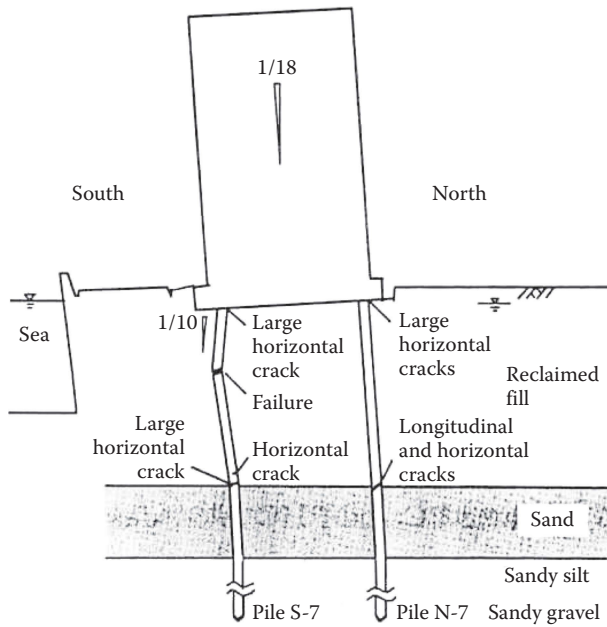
Failure of piles in a three-storied building in 1995 Kobe earthquake. (Adapted from Tokimatsu, K. et al. 1997. *Journal of Structural Engineering AIJ (Japan)*, 495, 95–100).
